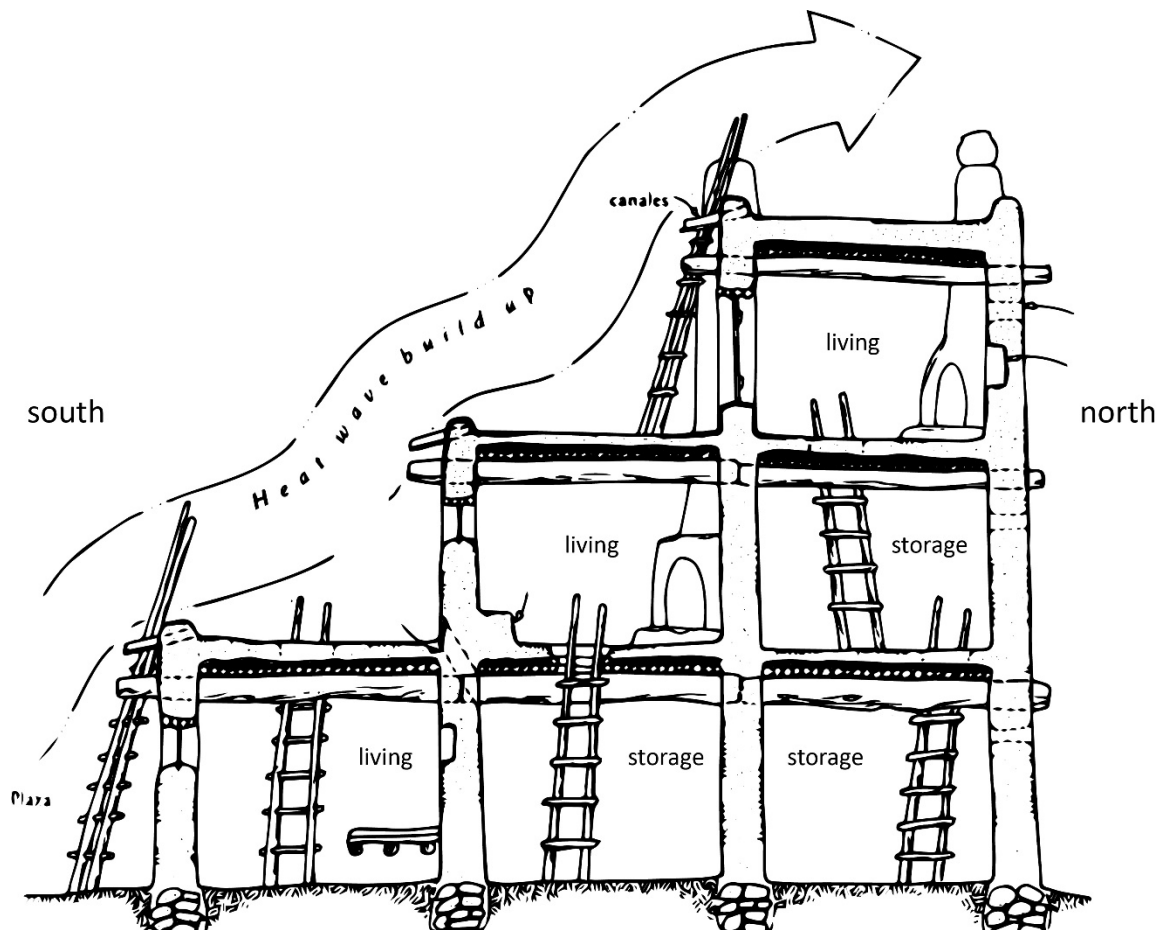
Section of Pueblo dwelling, showing the dark room and how heat wave pass though the building, (Native American Architecture, New York, 1989)
